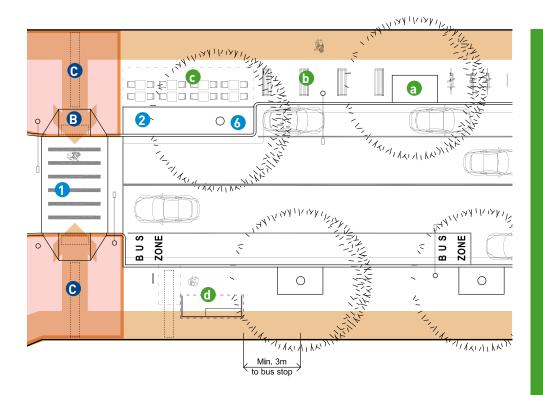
Typical Element Arrangement Diagram - 3.0m wide Footway
